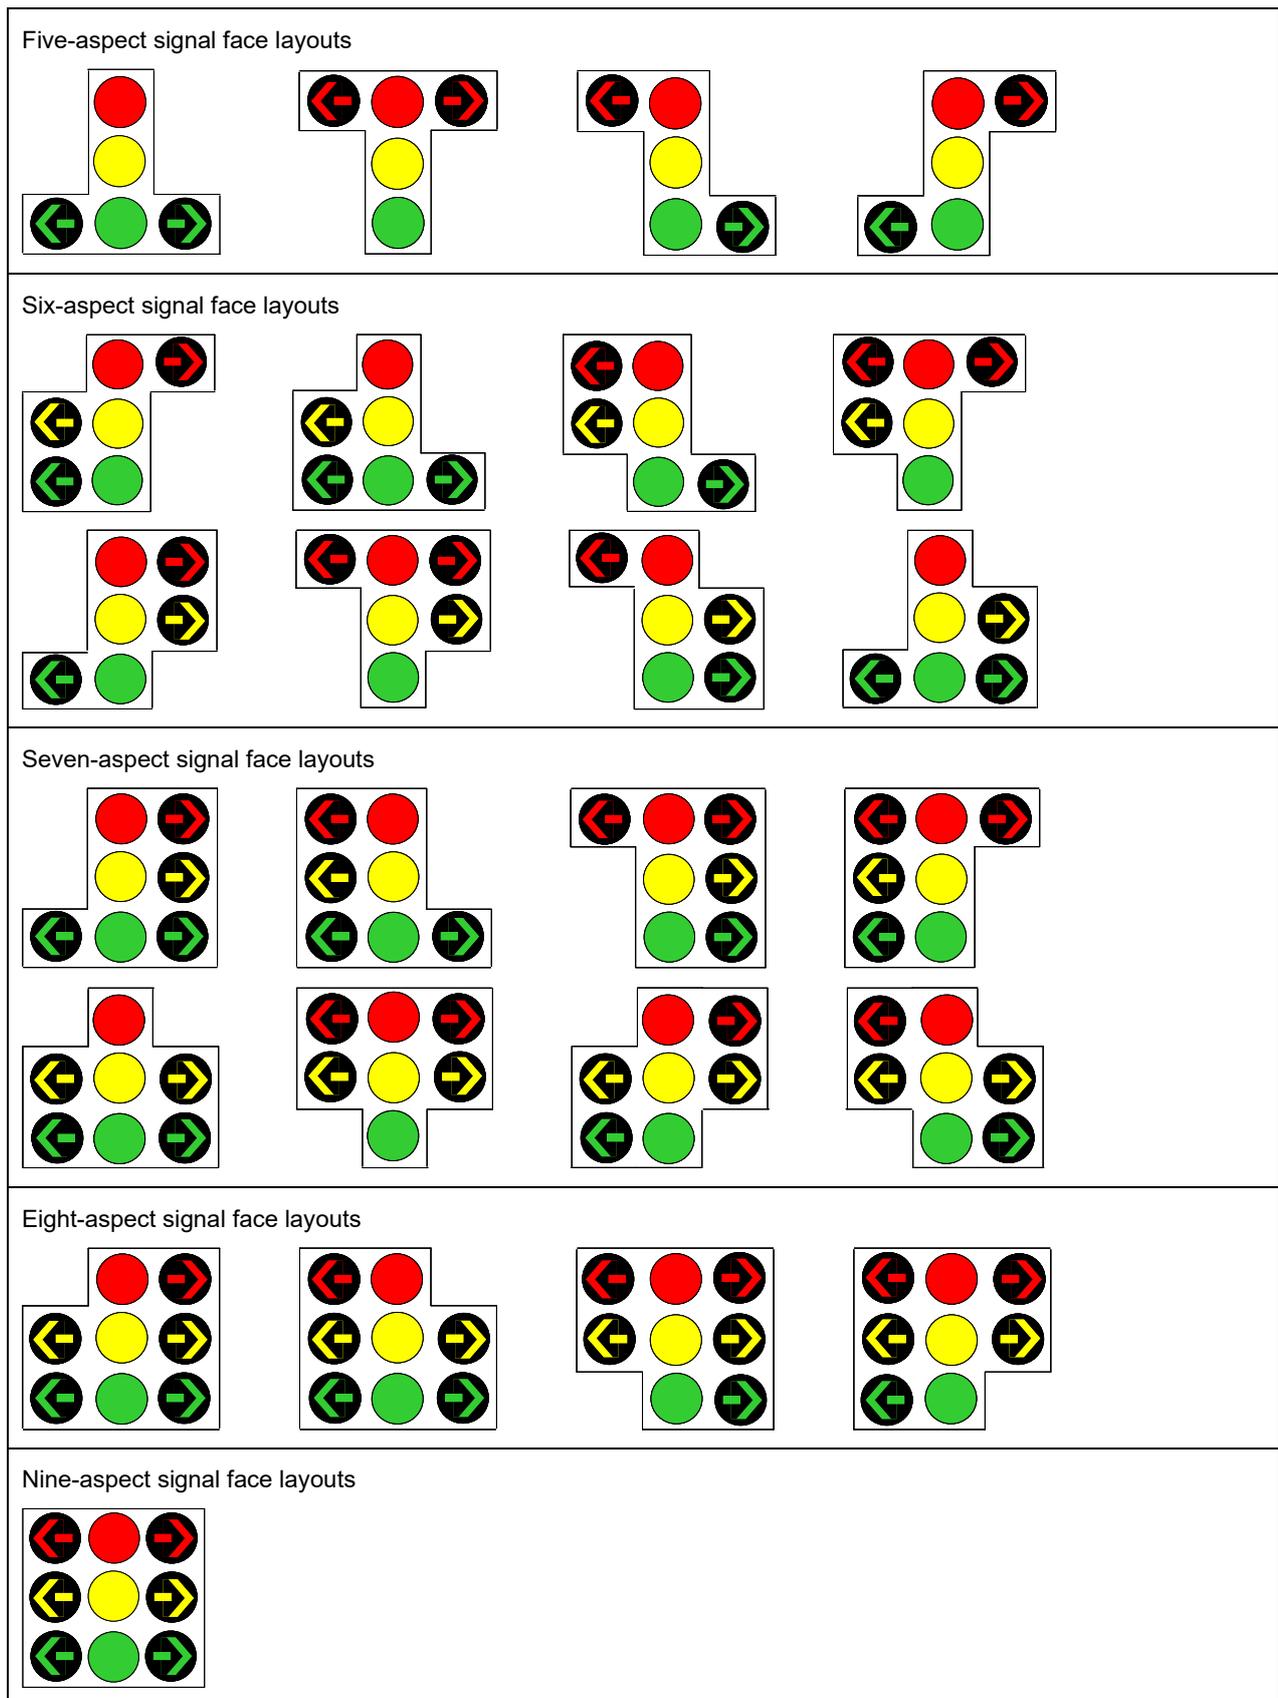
Signal face layouts that are permitted but should be avoided if possible
